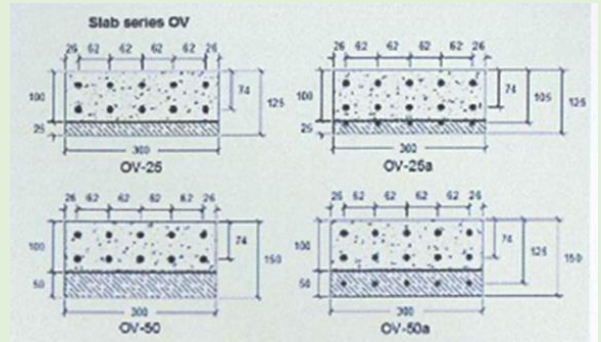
Details of strengthening configuration, sectional dimensions and reinforcement
